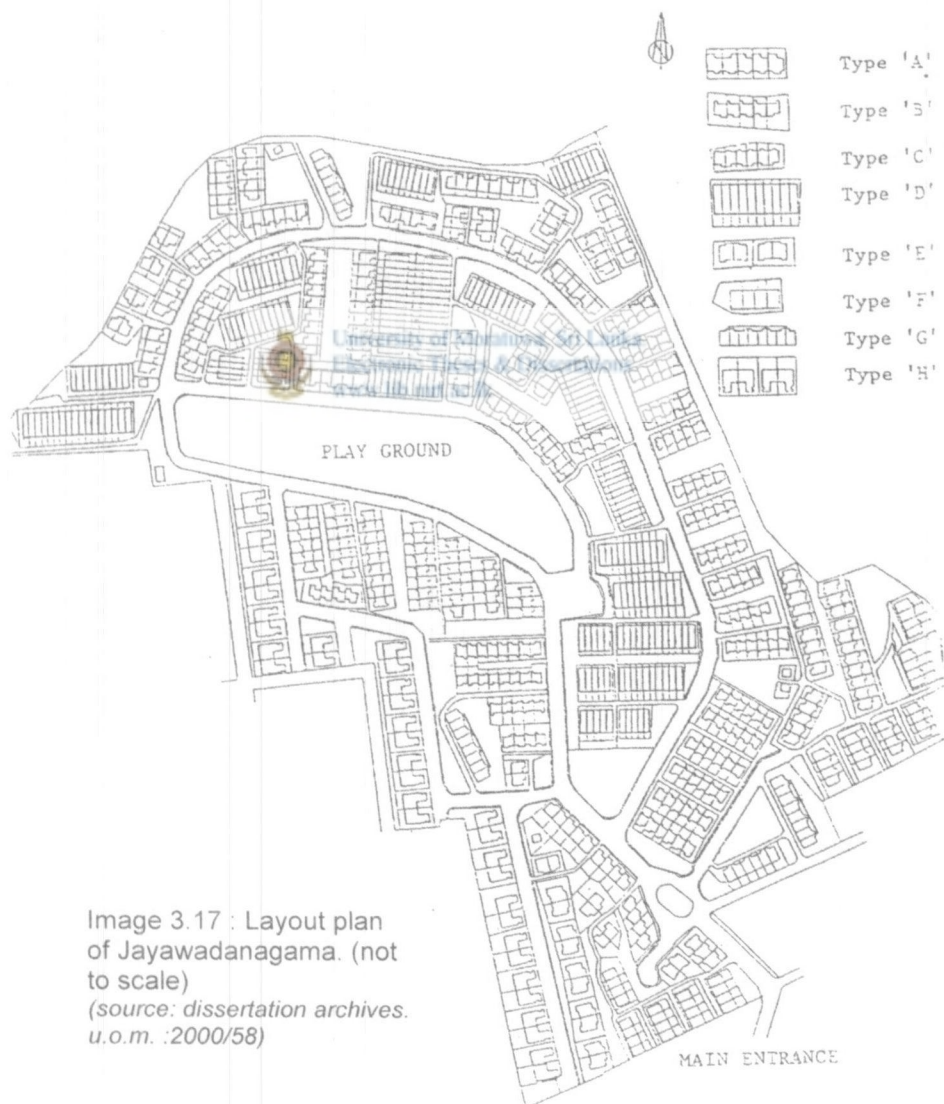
Layout plan of Jayawadanagama. (not to scale)
